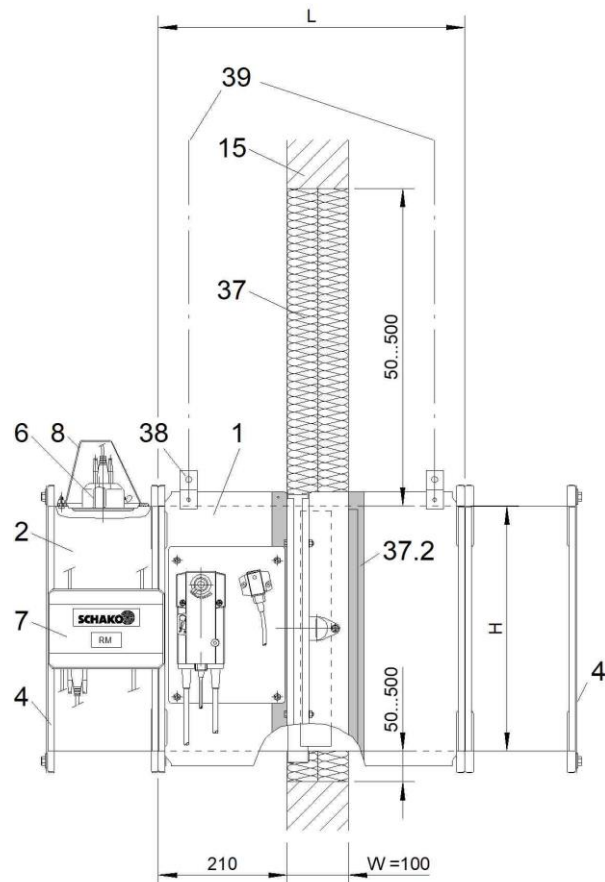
Installation in solid wall (wall thickness = 100 mm)
